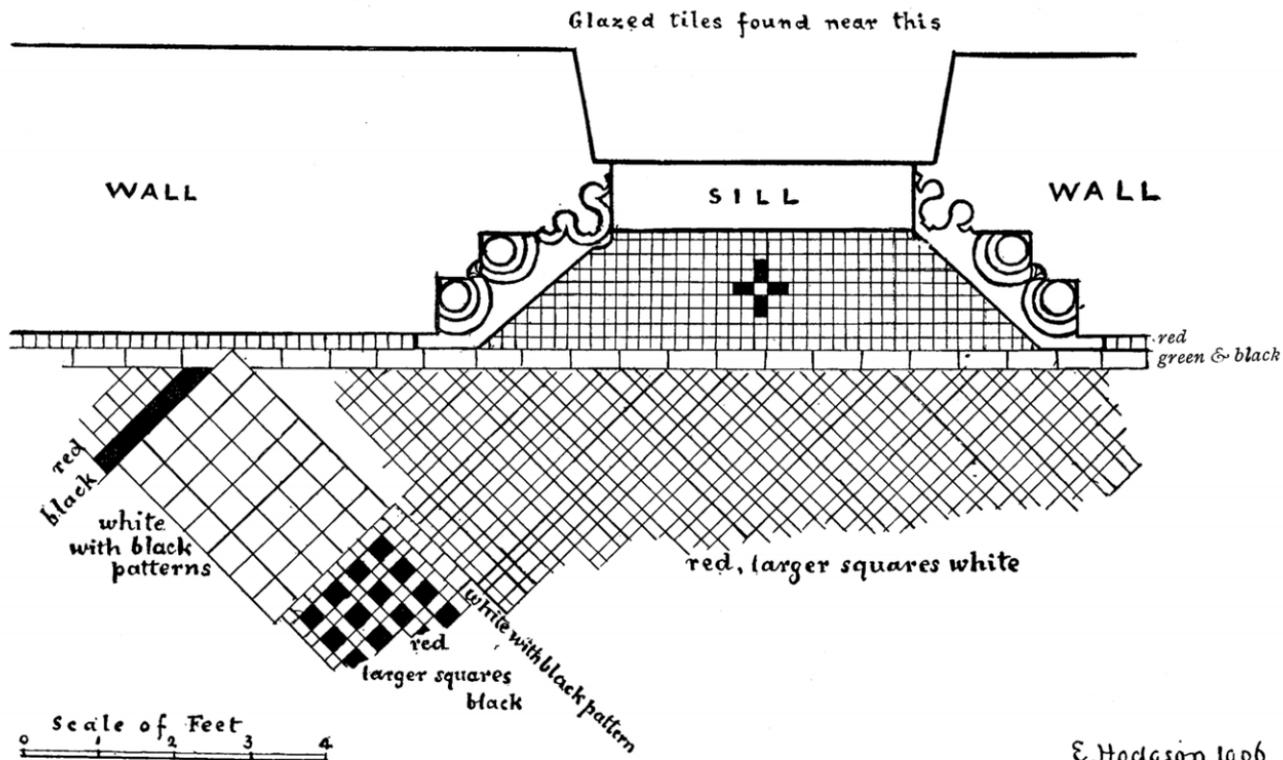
PLATE III.—HOLM CULTRAM. Plan of tiled floor and doorway.
